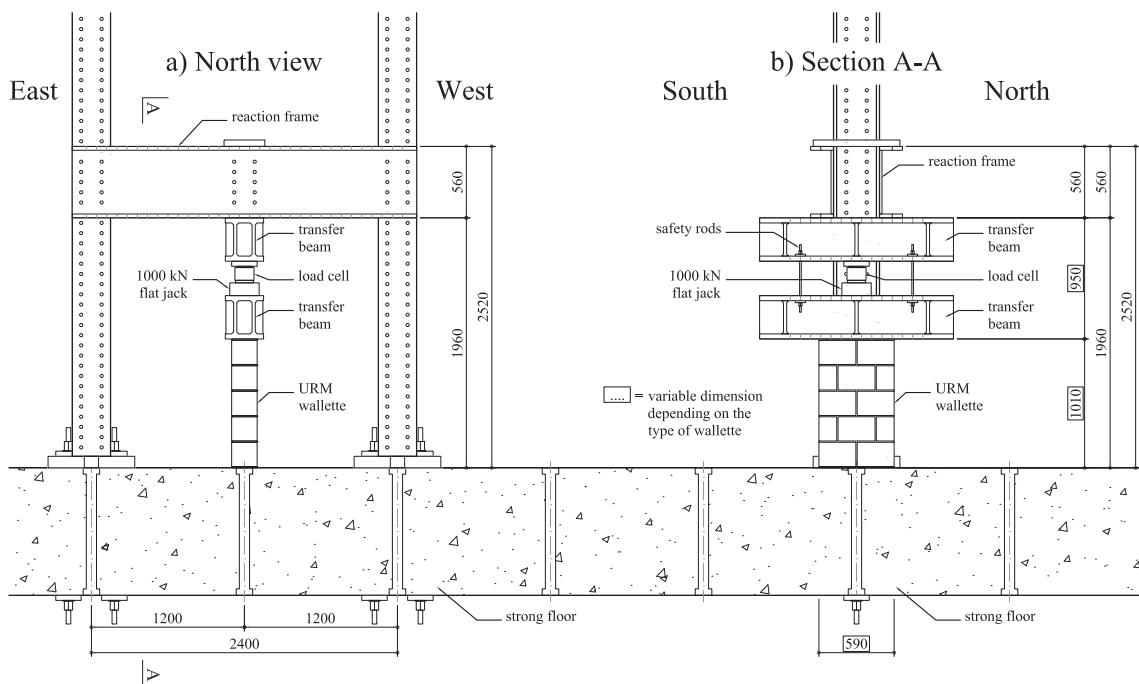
Drawing of the test setup for the compression tests on the masonry wallettes.
